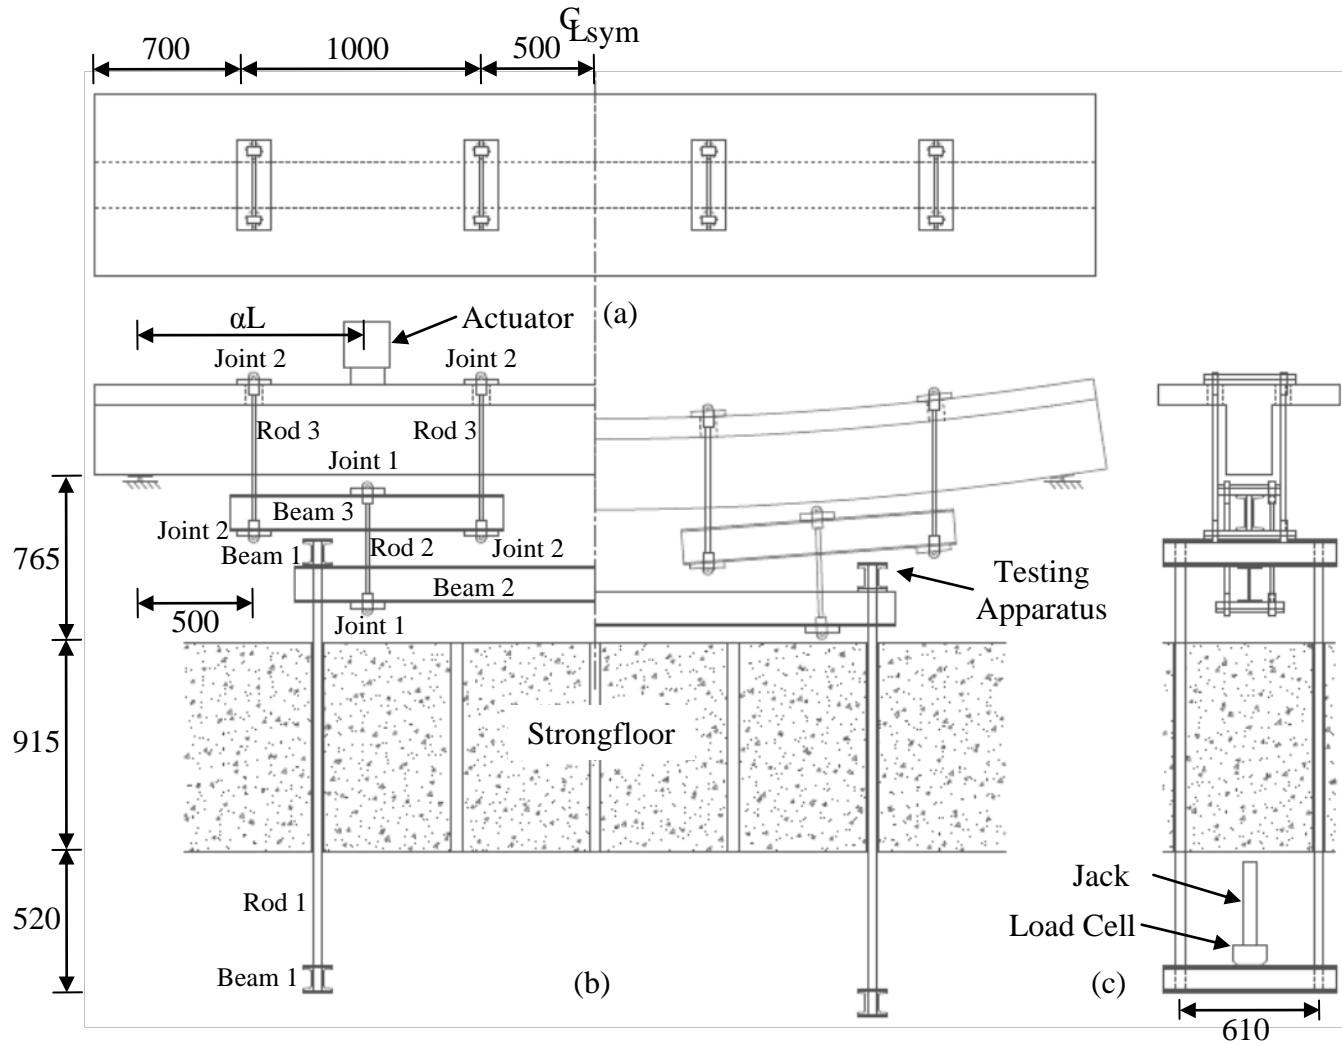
Testing Apparatus: (a) Plan, (b) Partial Elevations Showing Unloaded (Left) and Loaded (Right) Control Specimen and (c) End Elevation (All Dimensions in mm).
